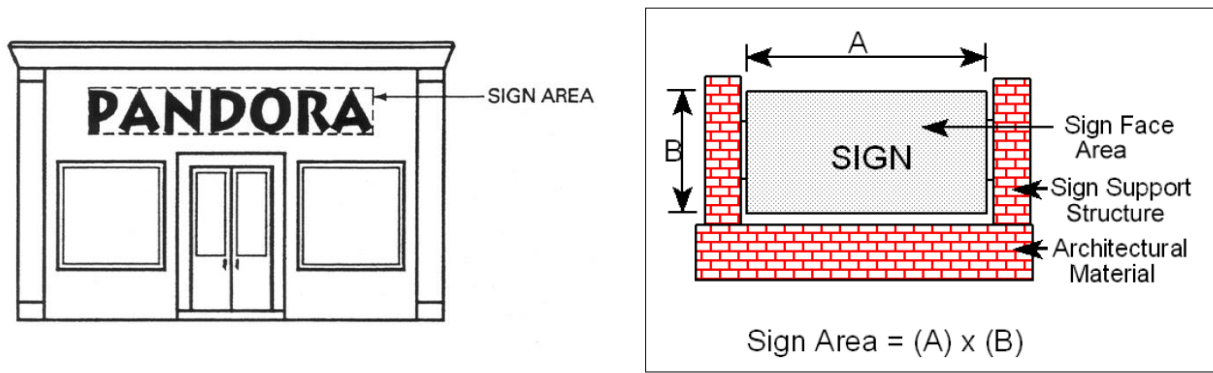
Illustration of sign area calculation for a wall sign (left) and a ground sign (right).
